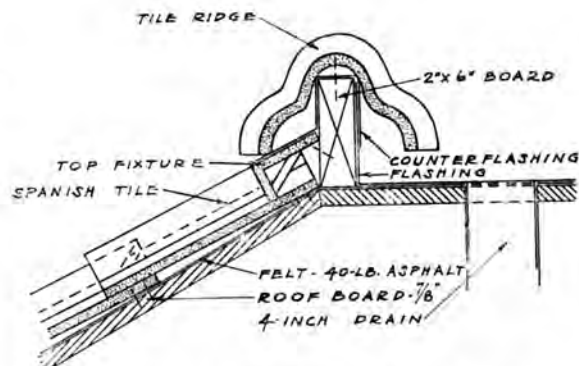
Method of Flashing at Deck When Inside Drain Pipe Is Used
